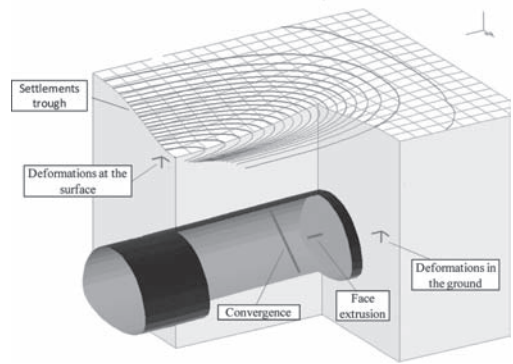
Ground deformations and surface settlements during the excavation of a shallow tunnel.
